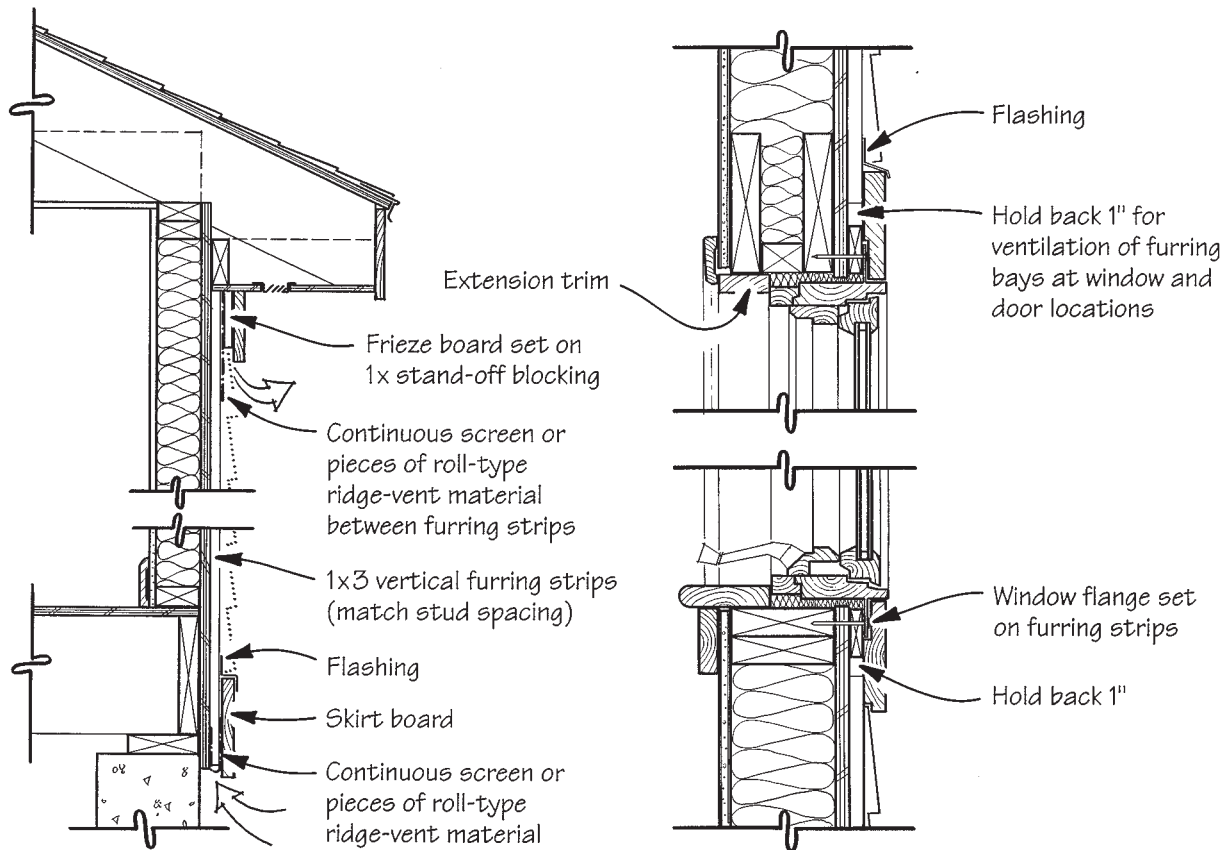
In new construction, install windows after applying a double-wide band of furring around the perimeter of door and window openings. Use screen and hardware cloth, or roll-type vent material, between furring strips at the top and bottom of rain screen walls to prevent insects and rodents from entering. Adjust frieze, corner board, and skirtboard details to accommodate the extra thickness of the rain screen furring.
